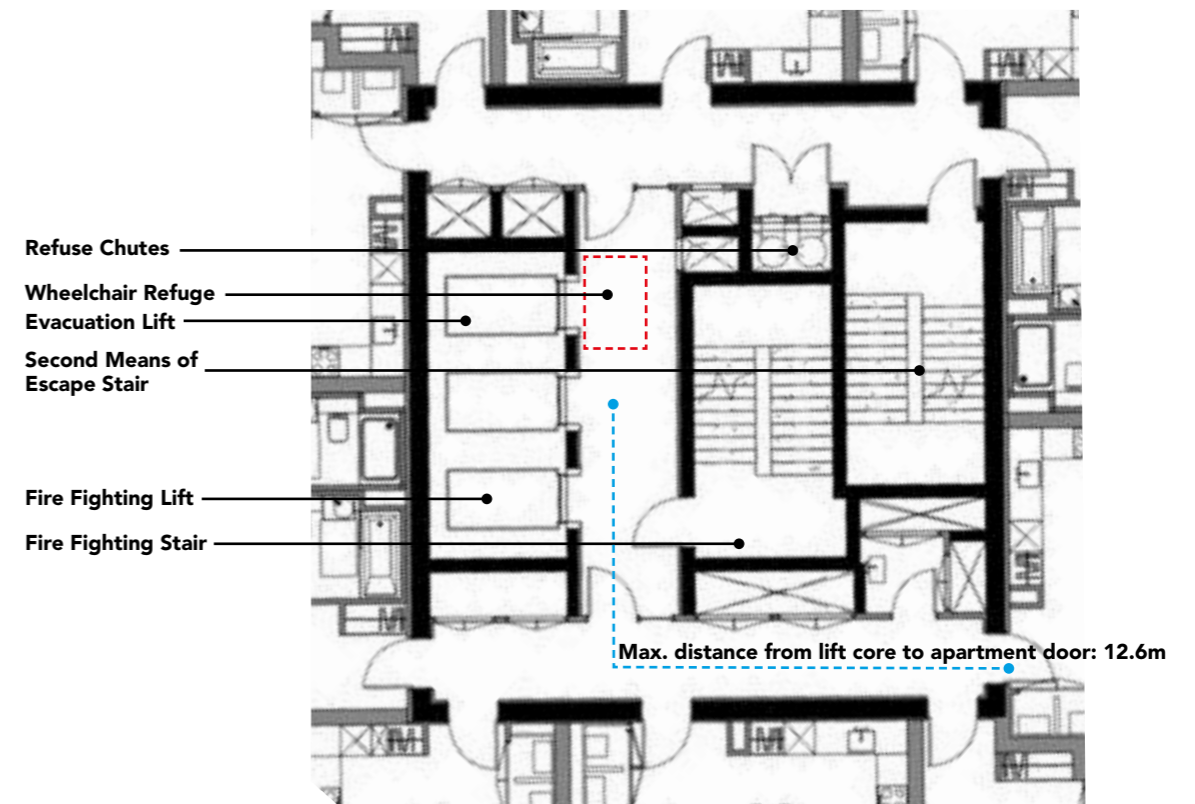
Stage 2 Core Arrangement with Two Fire Separated Stairs – towers
